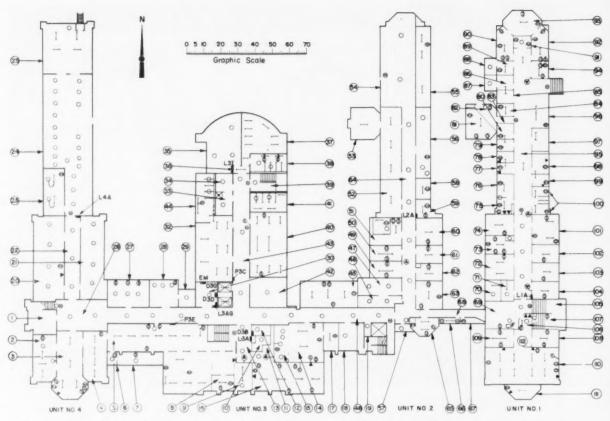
Floor plan of a building, showing existing outlets, fixtures, and panels. Room key numbers refer to Fig. 3.
